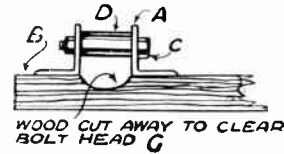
C.—SHOWING RAILS FIXED TO FLOOR OR JOISTS.
